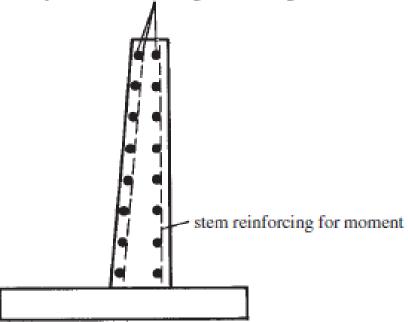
Cantilever retaining wall with tapered stem.
